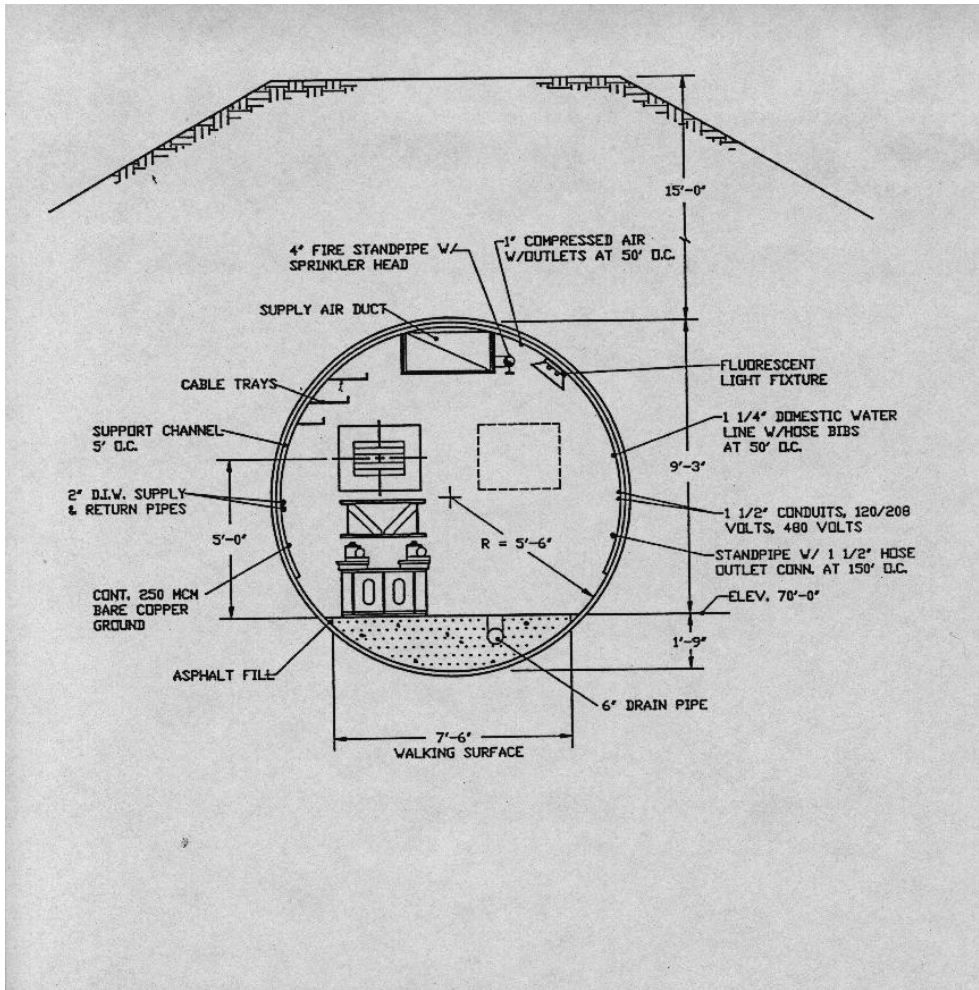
Nominal cross-section of Booster tunnel and berm. This is from the Ags Booster Final Safety Analysis Report, February 27, 1991. Note that the elevation of the tunnel floor is 70 feet. The center of the beam pipe is 5 feet above the floor and the top of the tunnel is 9 feet 3 inches above the floor. The nominal depth of soil over the tunnel is 15 feet.
